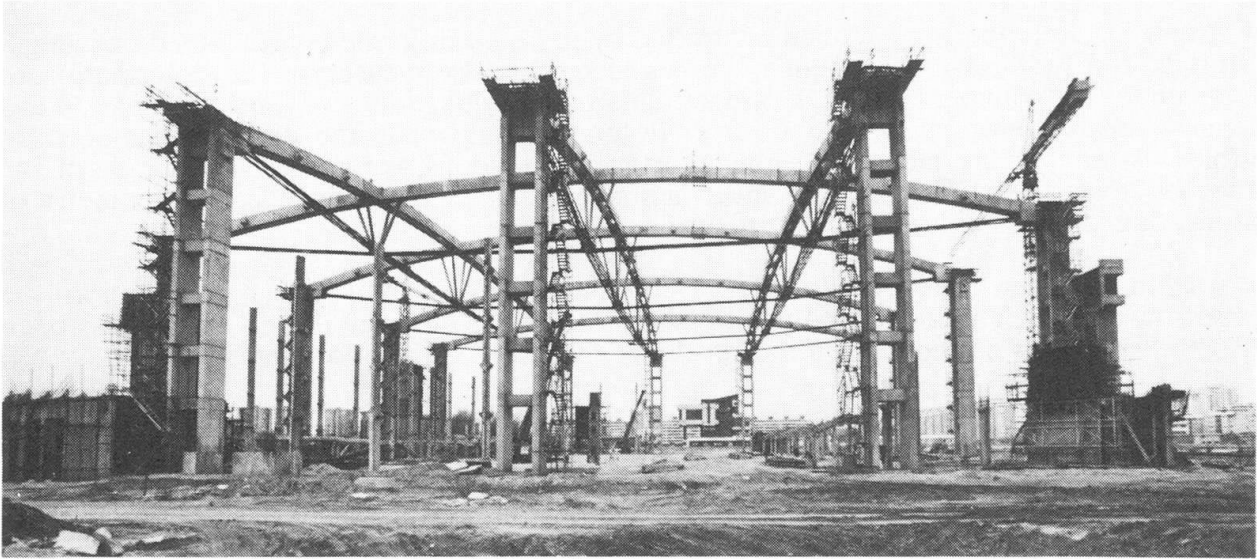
Main roof girders in the final design position on the tops of the main columns
